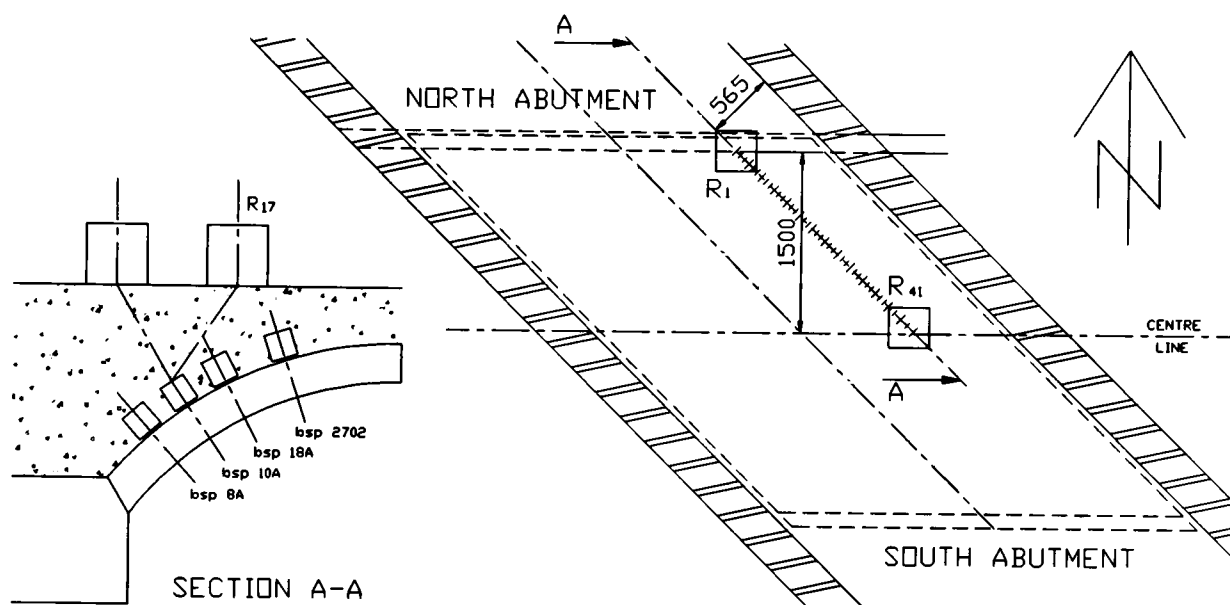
Position of 25.8 kN Point Loads on arch bridge 3-4
